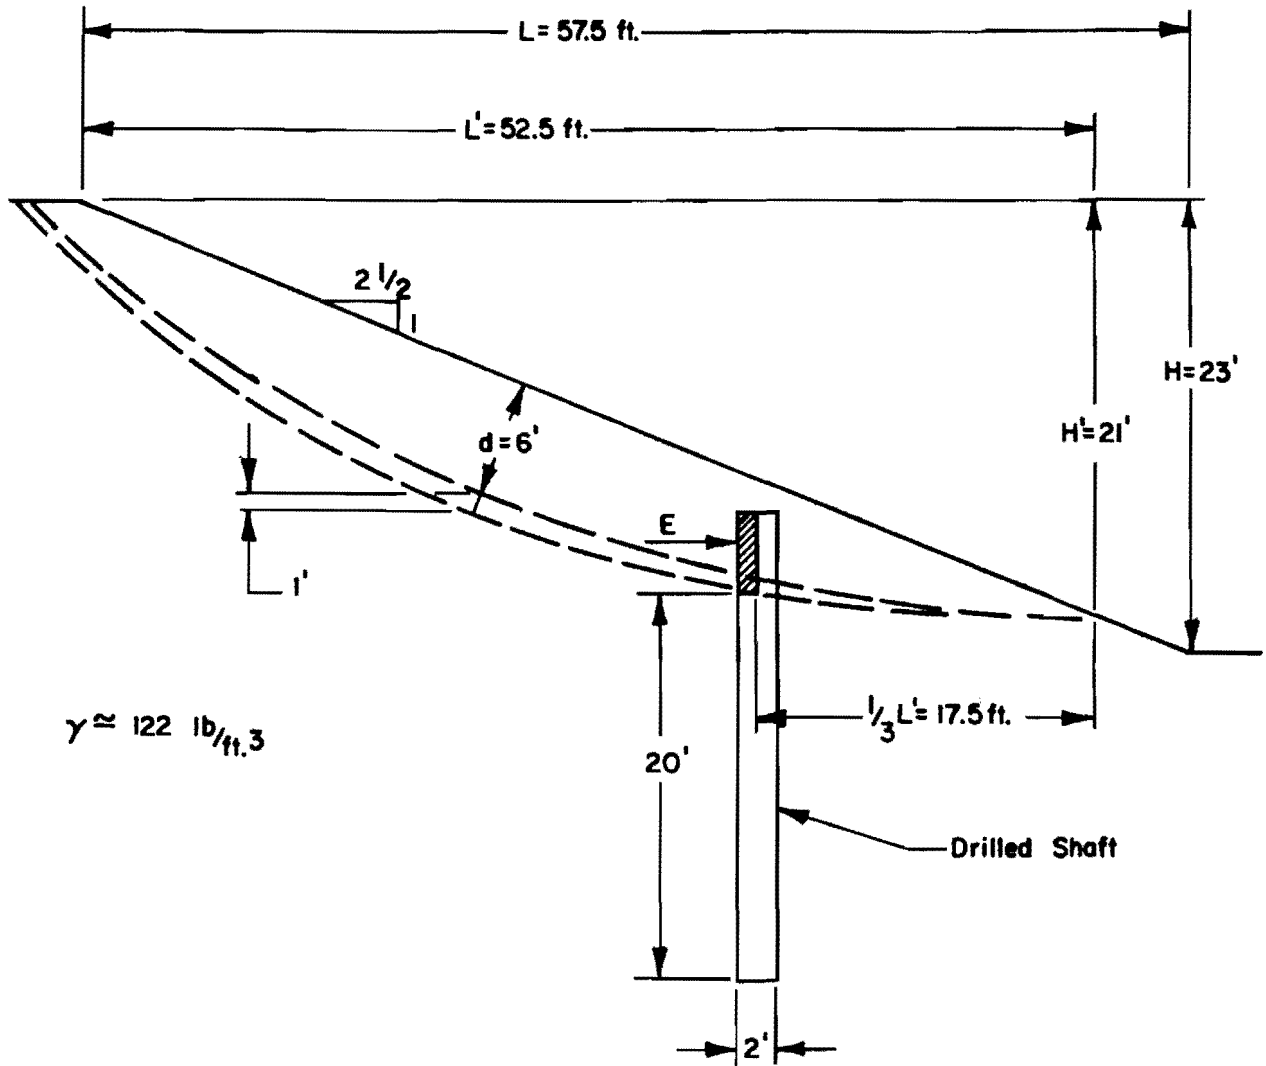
Simplified cross section of the slope on I.H. 35 under the Moore Street Bridge.
